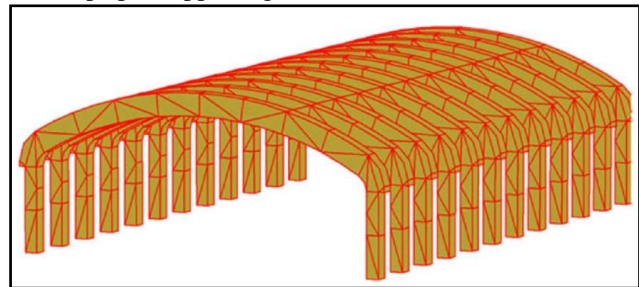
Rib-shape pre-supporting structure (CAPS) constructed prior to main excavation [10].
